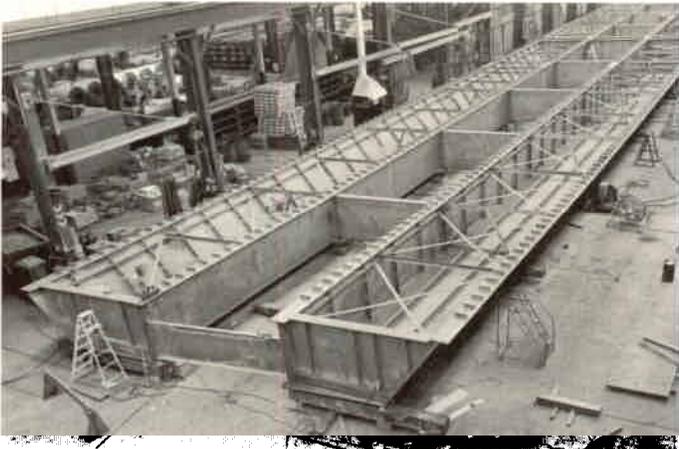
Omaha Nebraska Viaduct: shop assembly showing crossframe lateral bracing arrangement.
